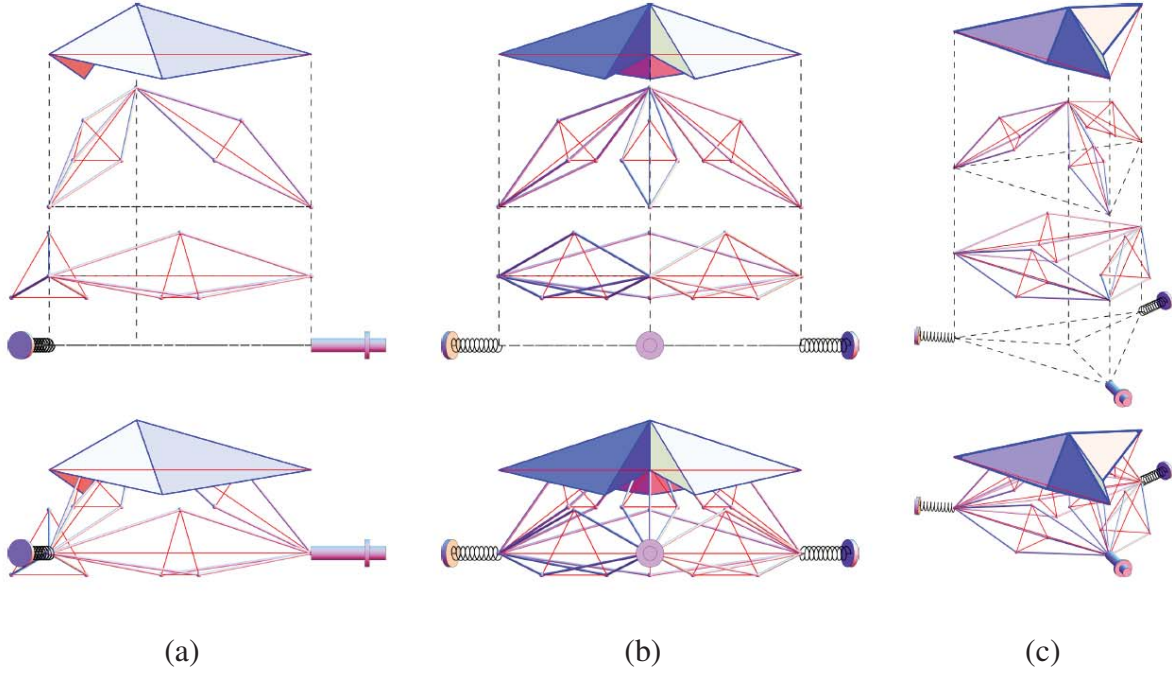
Three exploded (top panels) and assembled (bottom panels) views of TABS: (a) side view, parallel to the axis of actuator; (b) side view, in front of the actuator; (c) axonometric view. Exploded views allow to recognize the main components of TABS. From top: screen; D-bars inclined with respect to the rear building wall; D-bars parallel to the rear building wall; elastic restraints and actuator.
